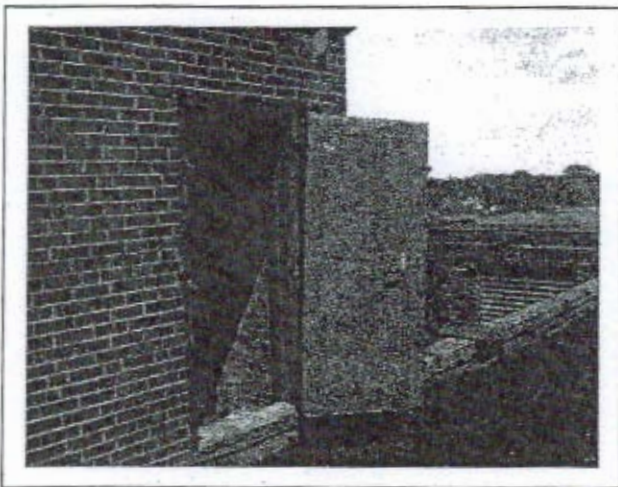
Viewing green roof entry door, Exterior – East side.
